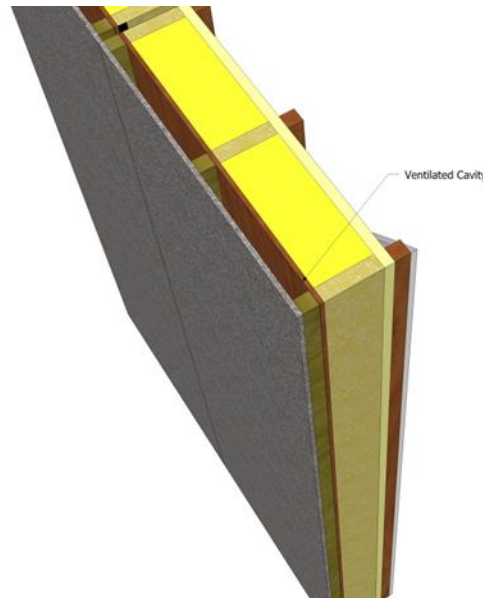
3D image of closed panel wall with ventilated cavity created behind external fibre cement board cladding
